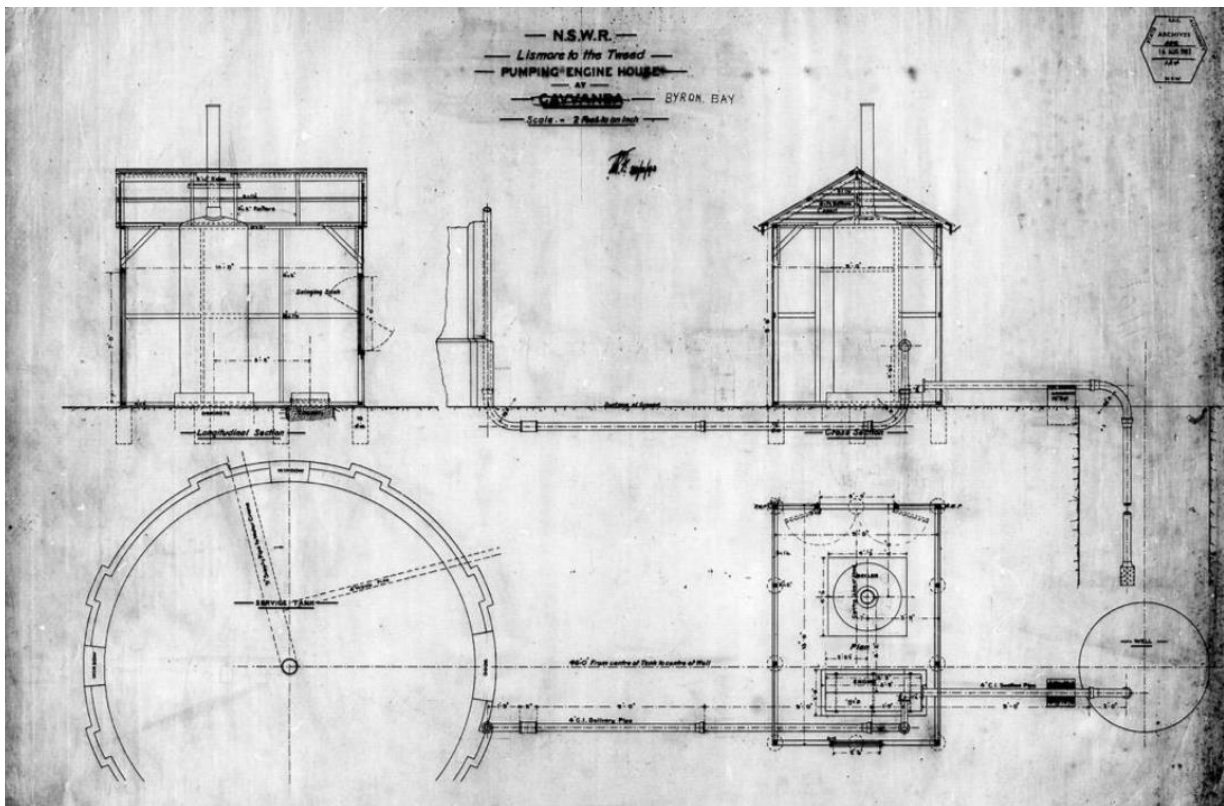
Pumping Engine House at 'Cavvanba' (corrected to "Byron Bay"), circa 1890, showing the water tower supplied from a well via a small steam pumping plant. The plan states that there is 45 feet between the centre of the tank and the centre of the well. (Source: Sydney Trains).
